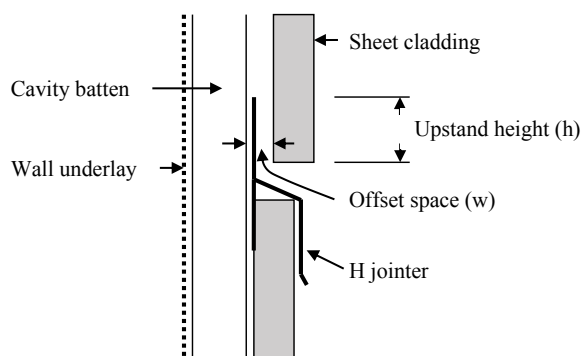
Sectional view through an H jointer between two sheets of wall cladding.
